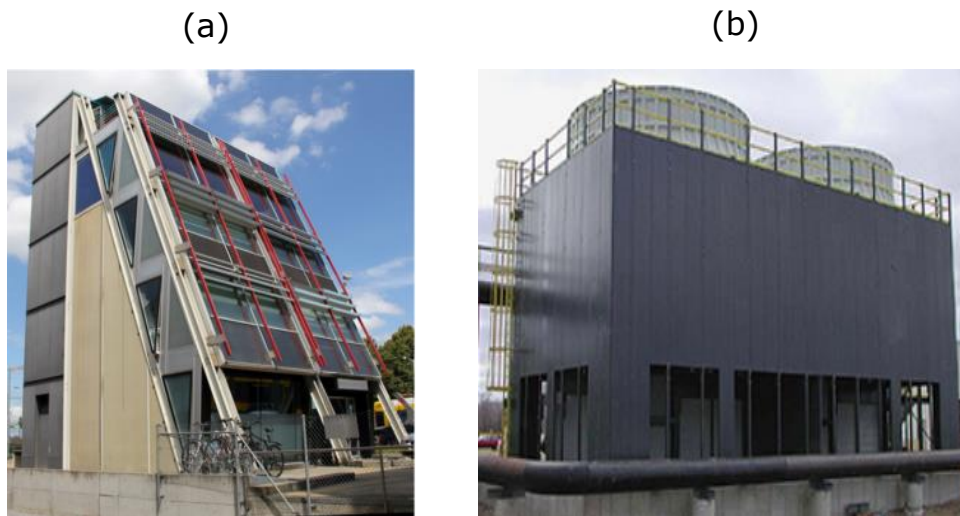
Applications of GFRP profiles in constructions; (a) 15 m tall building in Switzerland and (b) pultruded GFRP cooling tower [134, 138]
